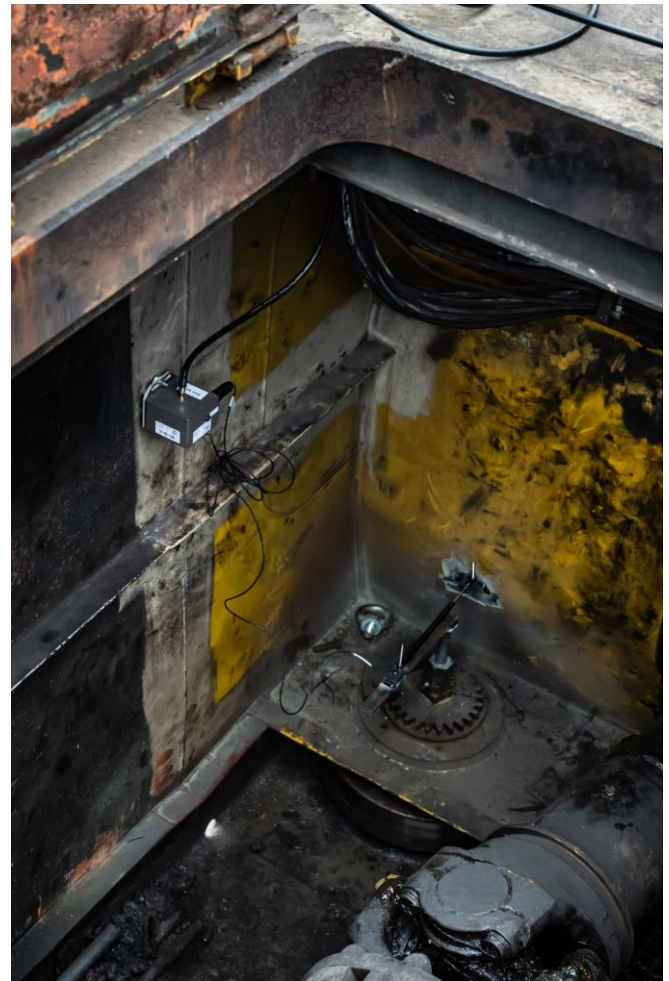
Crack sensor for detecting the internal deformation of the crane bridge
